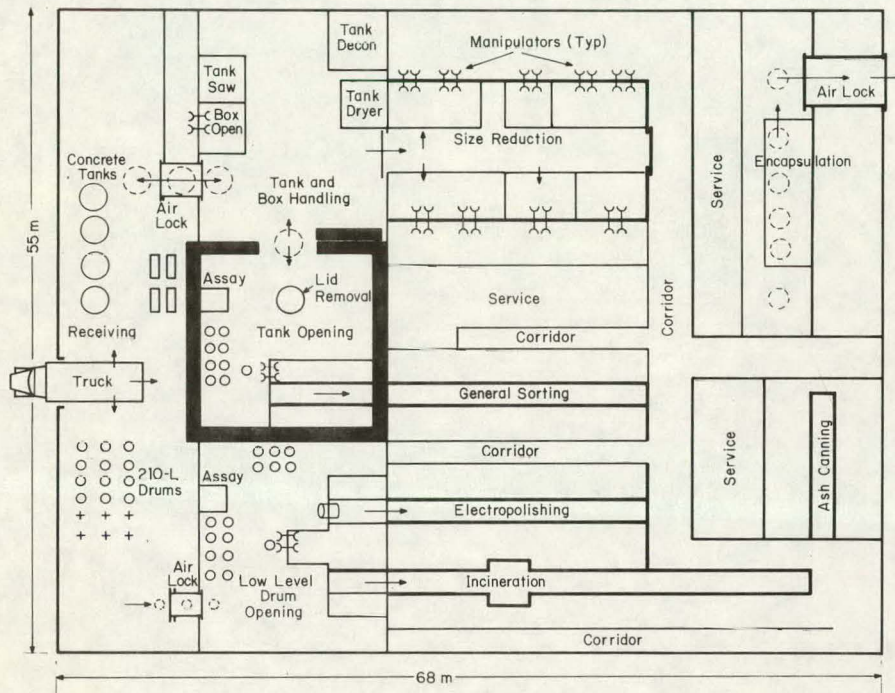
Plan of TRU Solid-Waste Facility Proposed for Savannah River Plant
